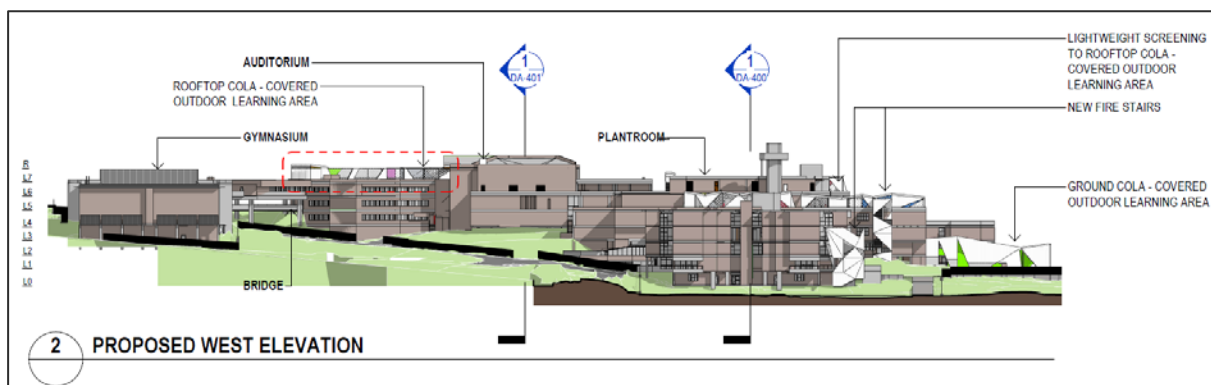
| West elevation – Phase 1 works outlined in red (Source: RtS)
